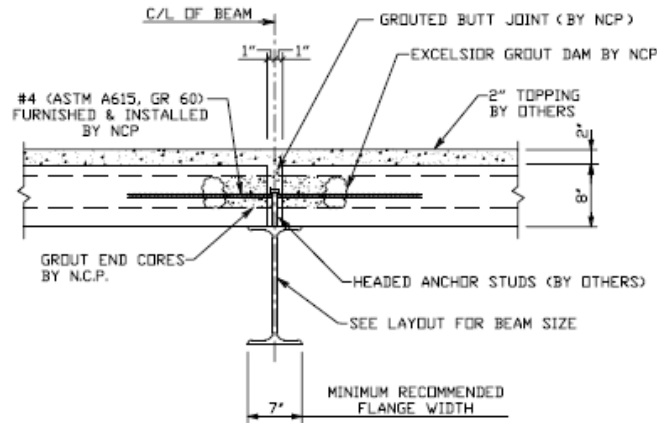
Typical connection with Steel beam courtesy of Nitterhouse
